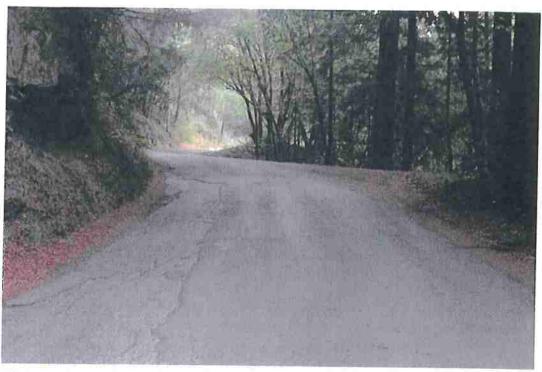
Mile 1.3: 16' width, 1' shoulders pinch point, OK visibility.
